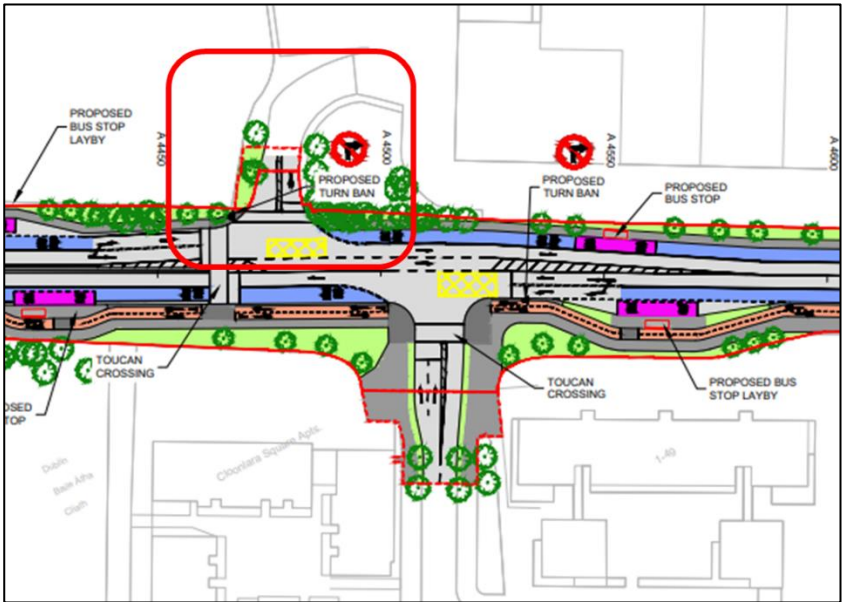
Proposed new Layout at Phoenix Industrial Estate
